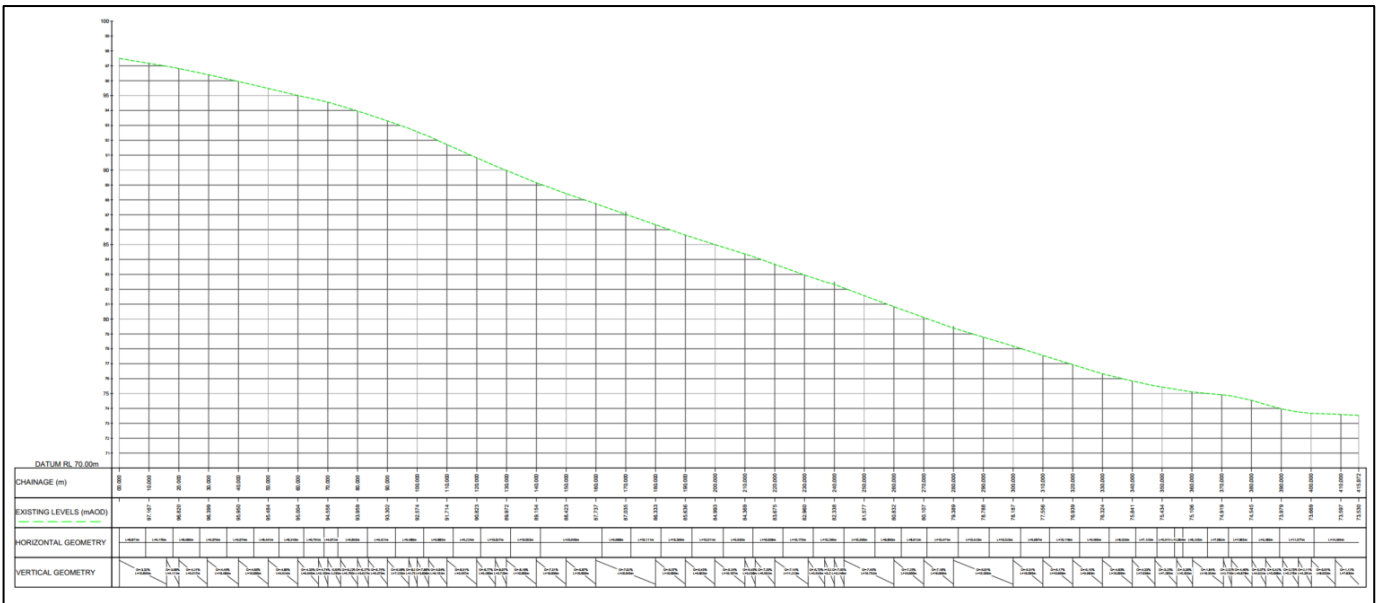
Existing Ground Elevation Profile of L5406 Willow Grove link road – Exit to N11
